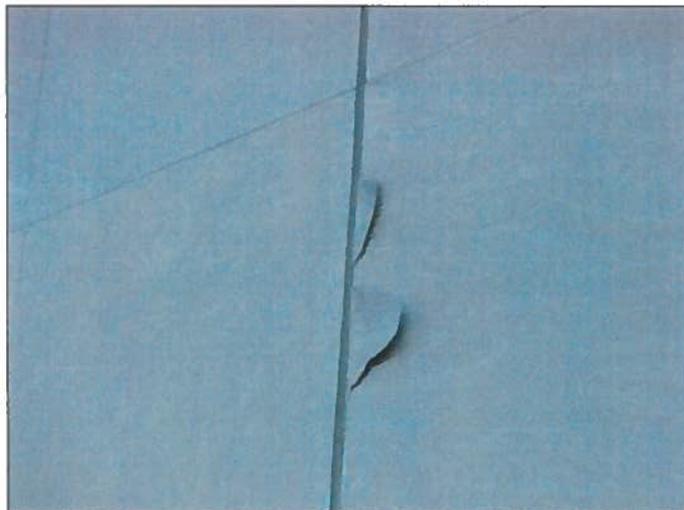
Spalled stone at sealant joint – Elevation 15
